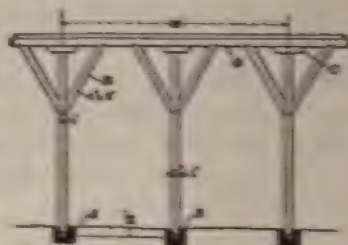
ISOMETRIC ELEVATION OF YARD CRANE.
